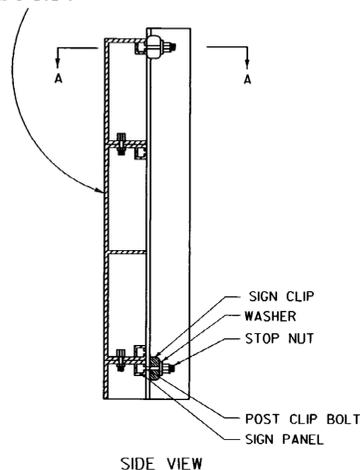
DETAIL EXTRUDED ALUMINUM RIB ALUM. ALLOY 6063-T6
